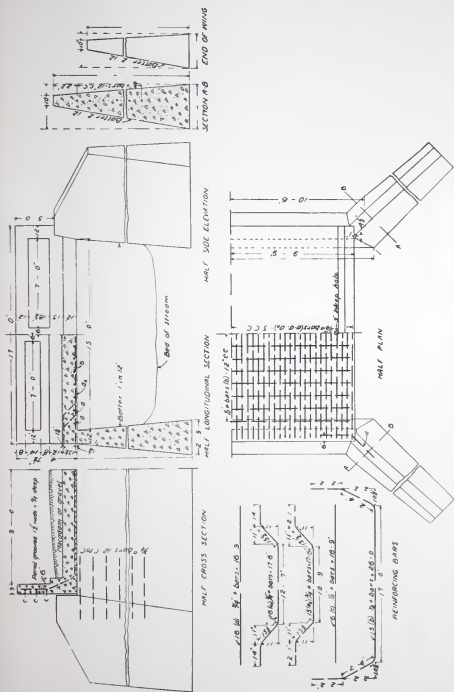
Concrete bridge of 15-foot span at Manhattan, Kans. Designed in the office of the State Engineer at the Kansas State Agriculture College.
